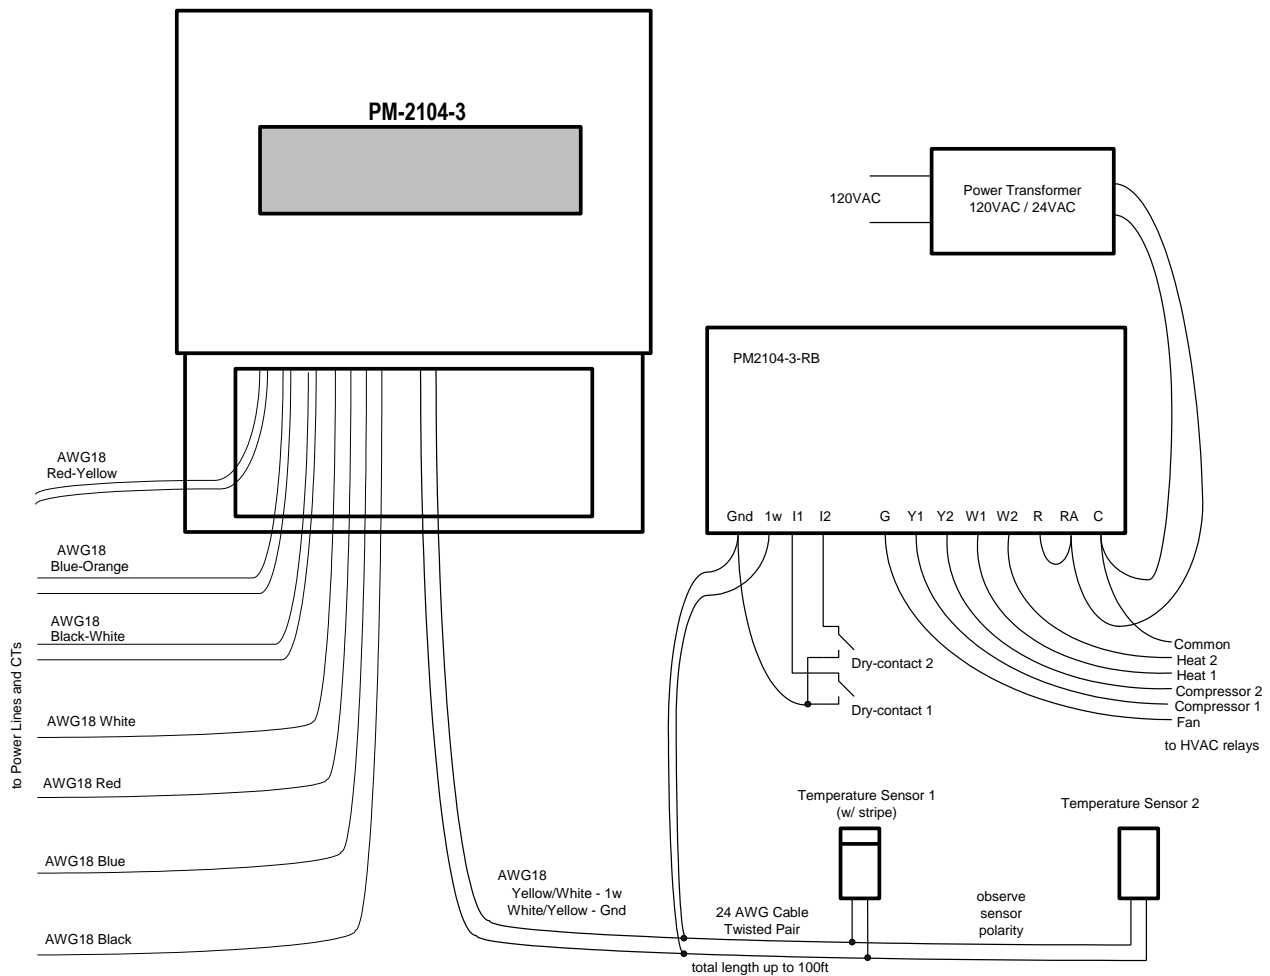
PM-2104-3 controls two-stage heat and two-stage cool heat pump system. external Relay Board, single power transformer, two wired sensors, two dry-contact alarms
